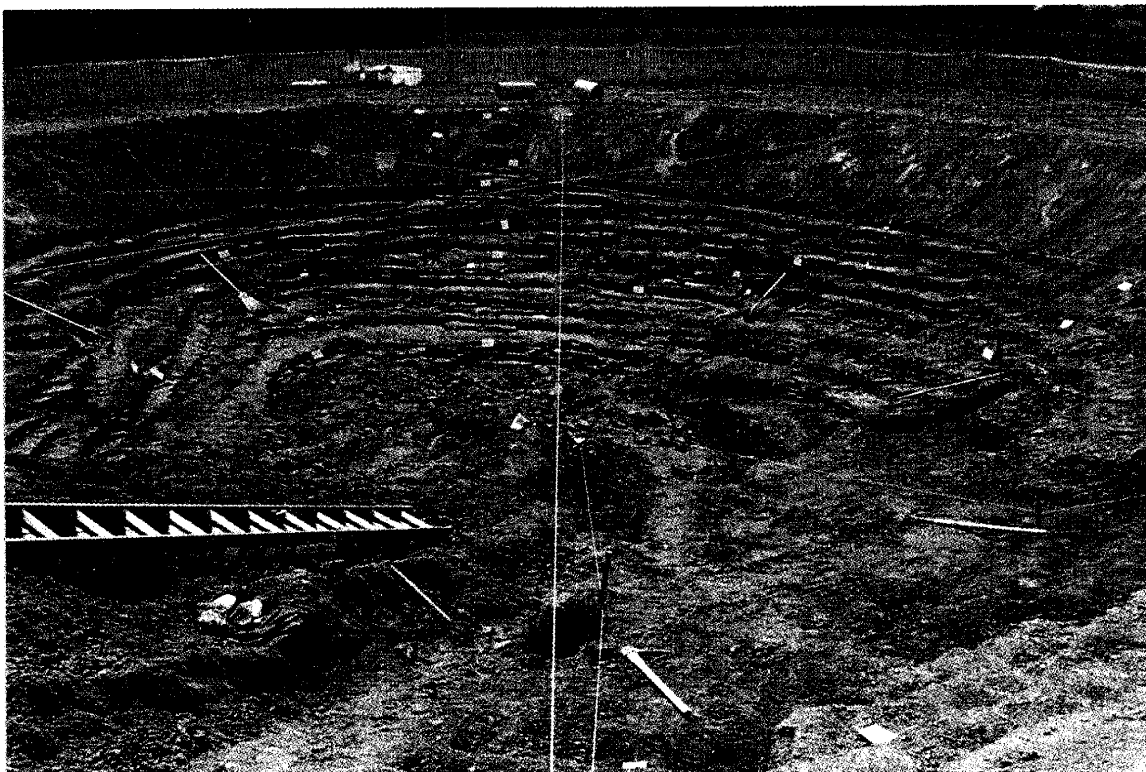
View of the excavation at noon on August 26, 1994, facing South.
